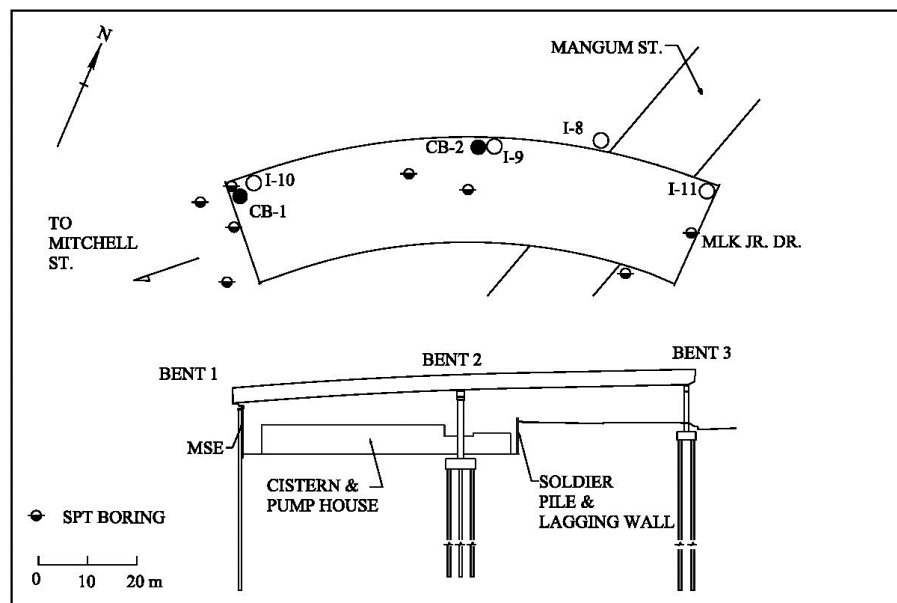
Bridge plan and profile, with locations of borings, test piles and indicator piles.
